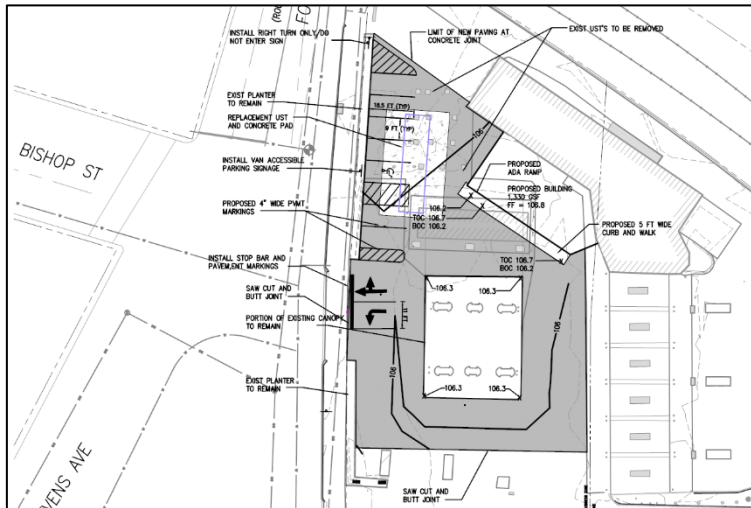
Proposed site plan with additional parking, reconfigured canopy and convenience store addition
